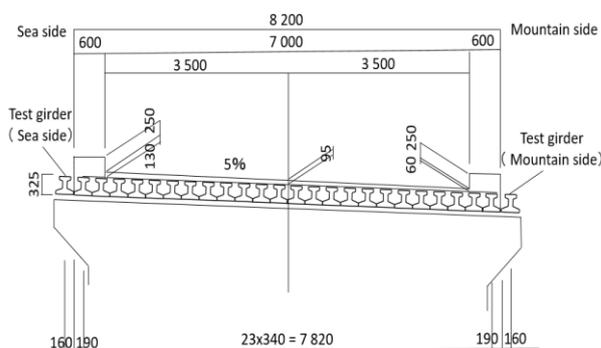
Cross-section of Shinmiya Bridge (unit: mm)
